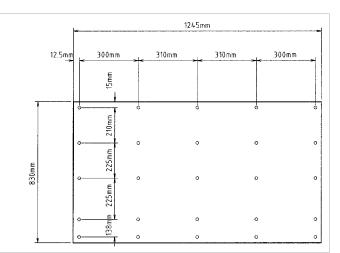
Attachment points and assembly spacing of the REHAU CES panels with a width of 125 cm
